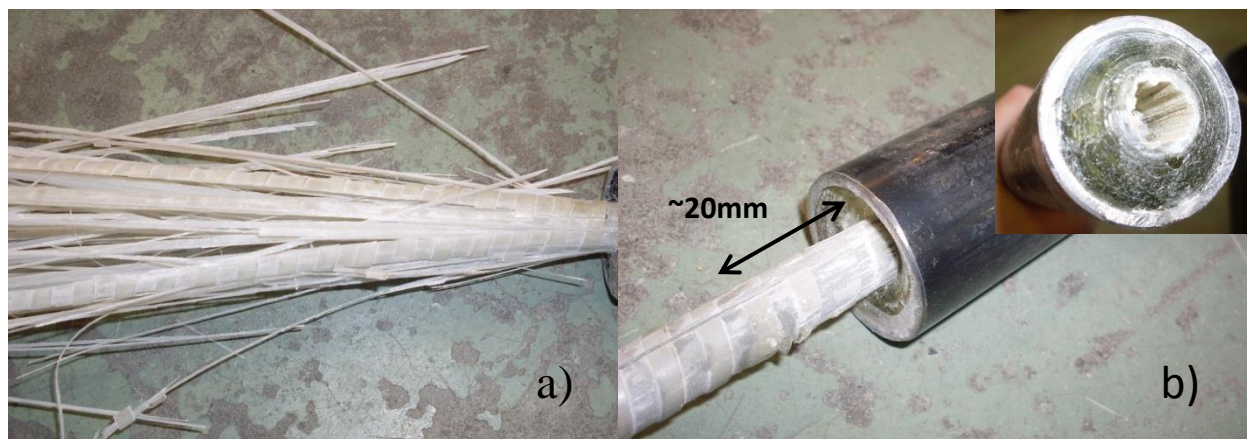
Close up photographs showing the two different failure types observed: a) Fracture of bar over entire length. All tests presented in this chapter failed in this manner. b) Pull out failure in epoxy (Inset: view from end of steel tube, clearly showing cavity where bar has pulled out).
